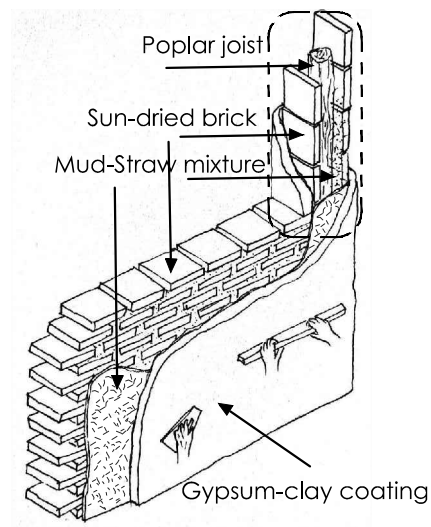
Connection of vertical joist and horizontal beam by Male and Female joint using wooden pins, Amiri House. Figure 3.6 Integration of wooden joists and bricks and utilization of wooden pins to make a comprehensive joining between timber beams in a boundary wall in Ghomi House.
